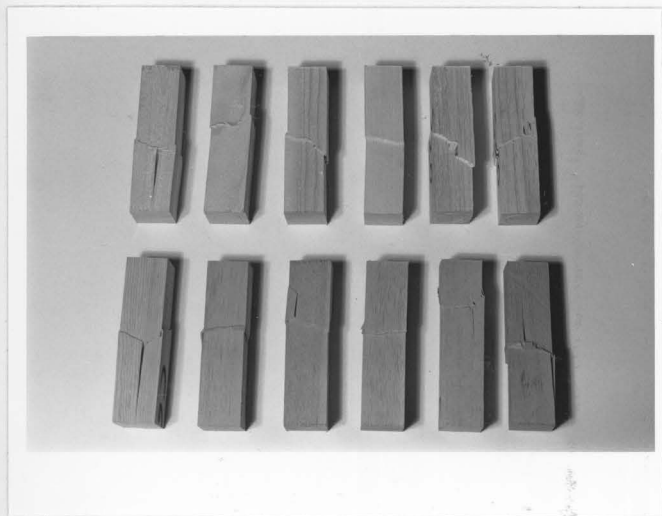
TYPICAL FAILURE IN COMPRESSION SPECIMENS
